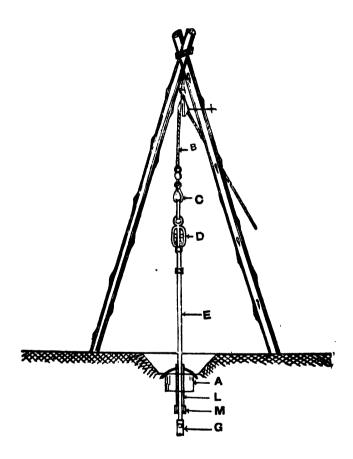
(B) Sinking rope. (C) Swivel hook. (D) Martin's sludger. (E) Boring rad which is hollow in this case. (A) Guide drum. (L) Casing or boring tube. (M) Cutting shoe. (G) Boring tool.
